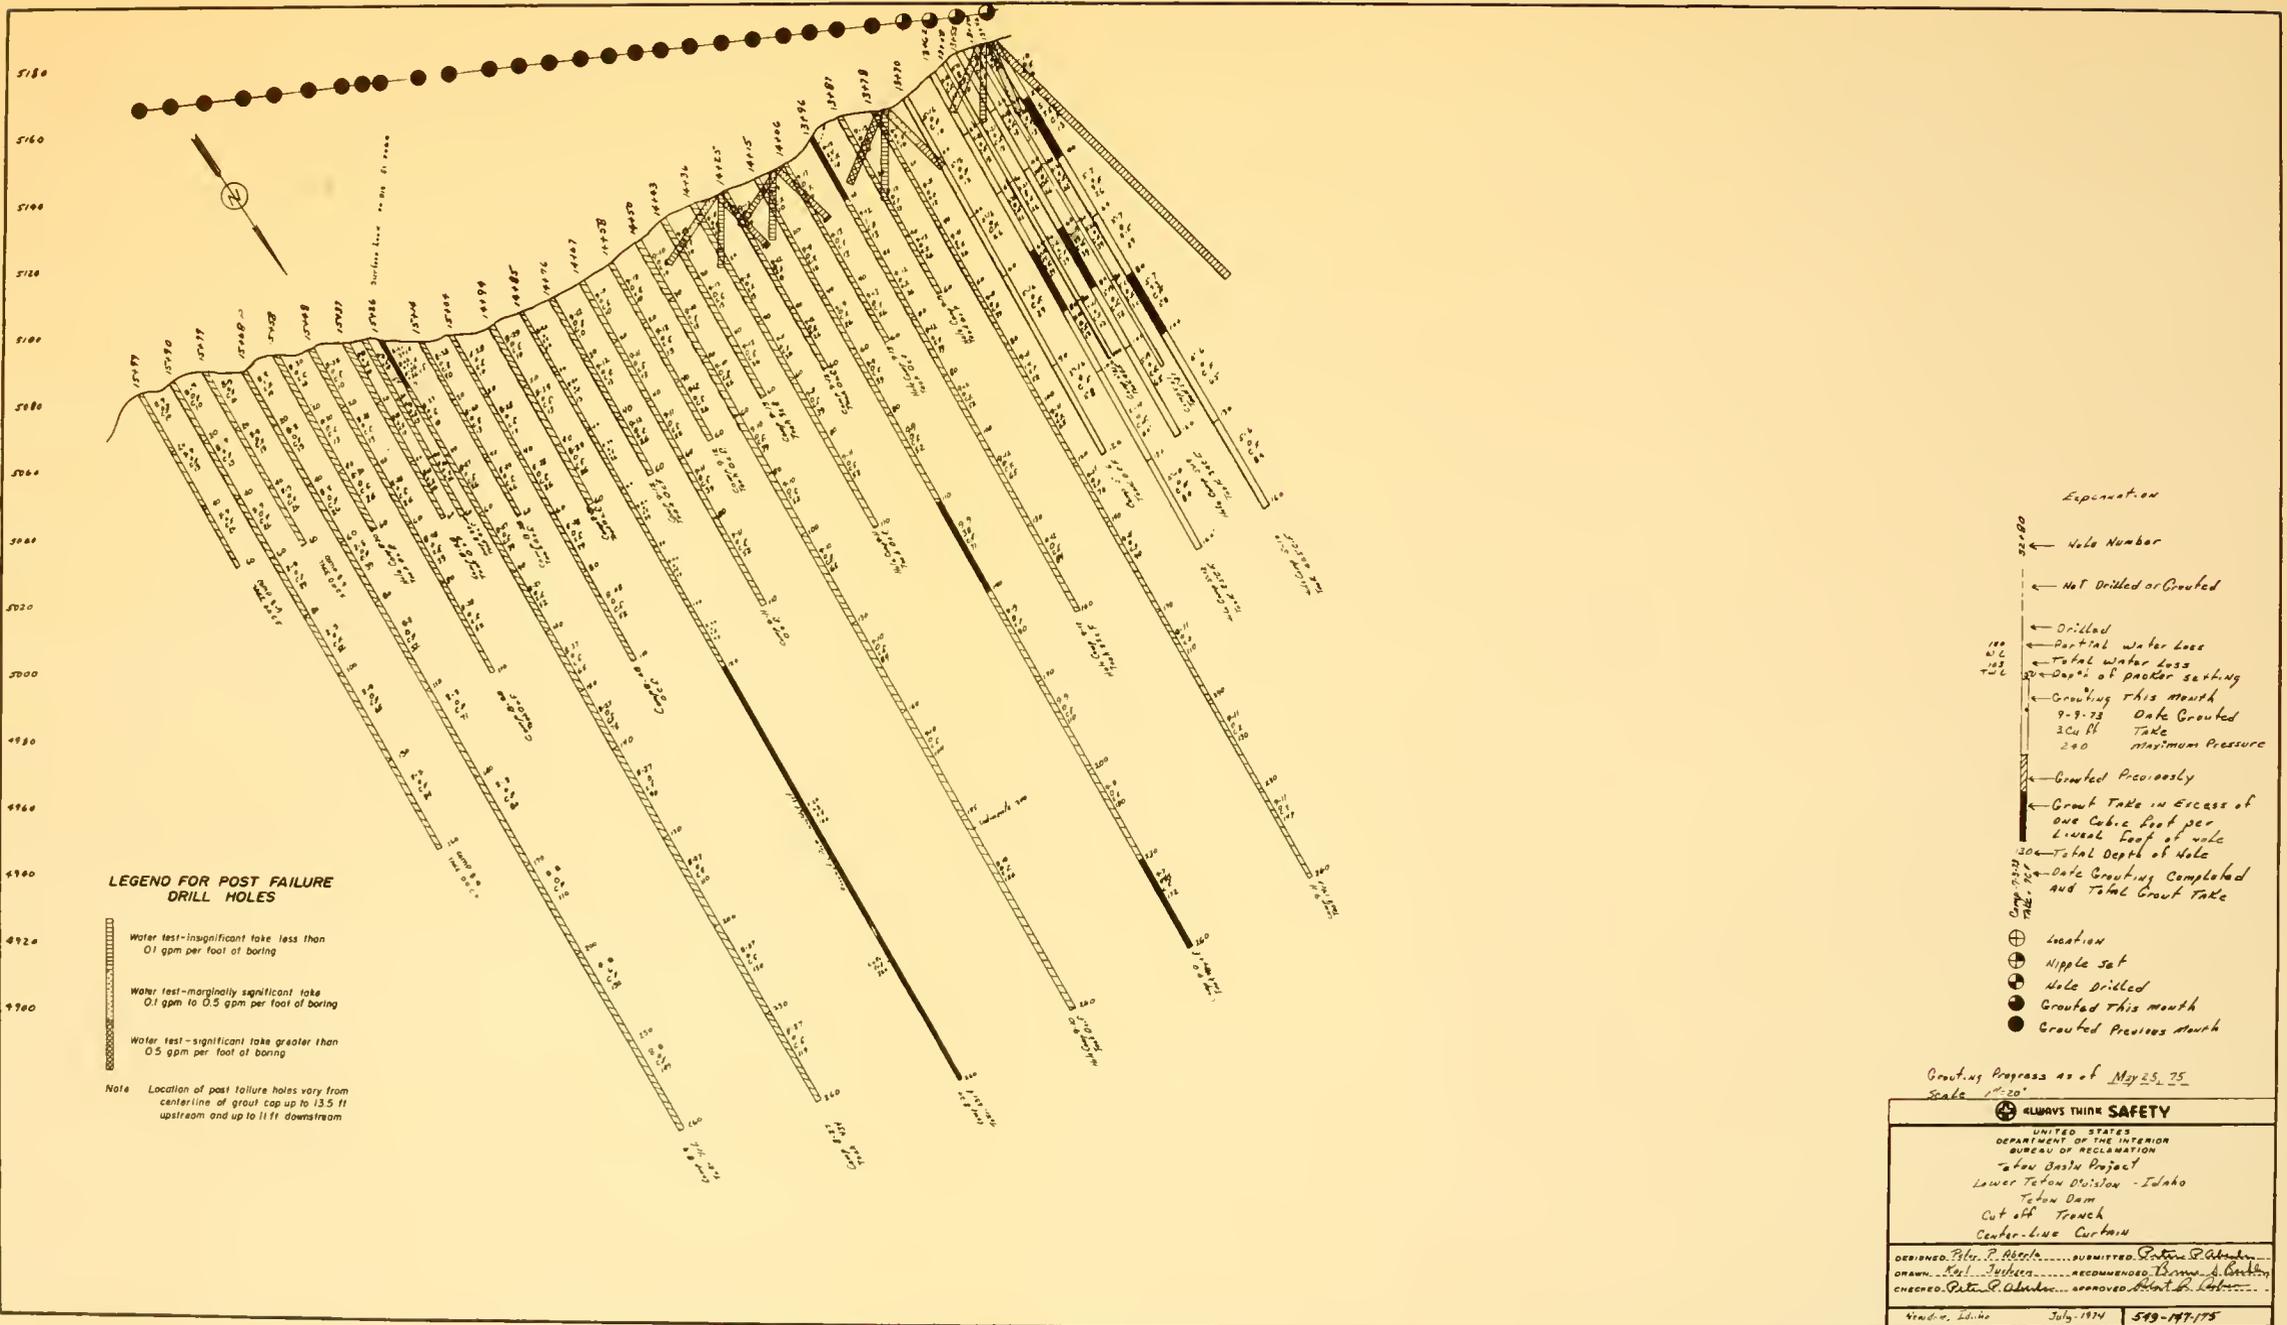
Details of the right abutment centerline grout curtain including postfailure core borings (sheet 2 of 3).
